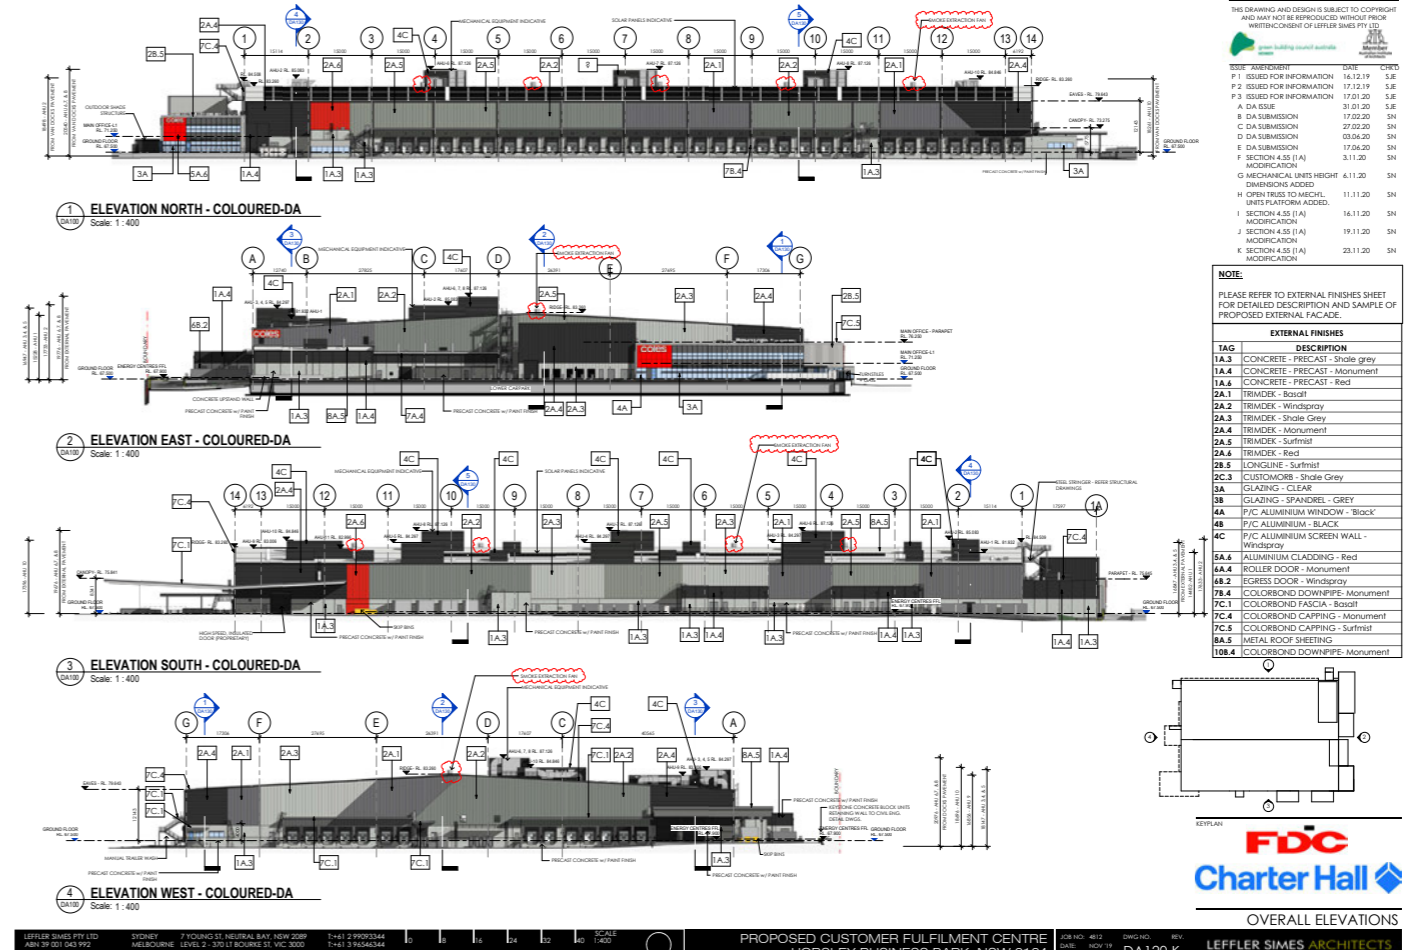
Proposed Customer Fulfillment Centre SSD S.455 Modification 1 Elevations (Source: Leffler Simes Architects)
